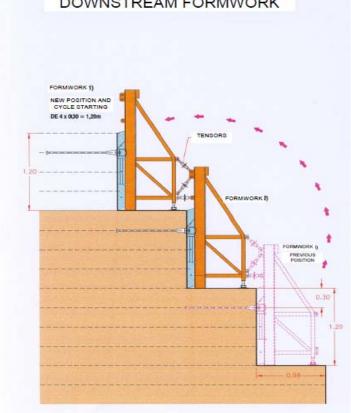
Dragados' Proprietary Formwork System for RCC Construction
